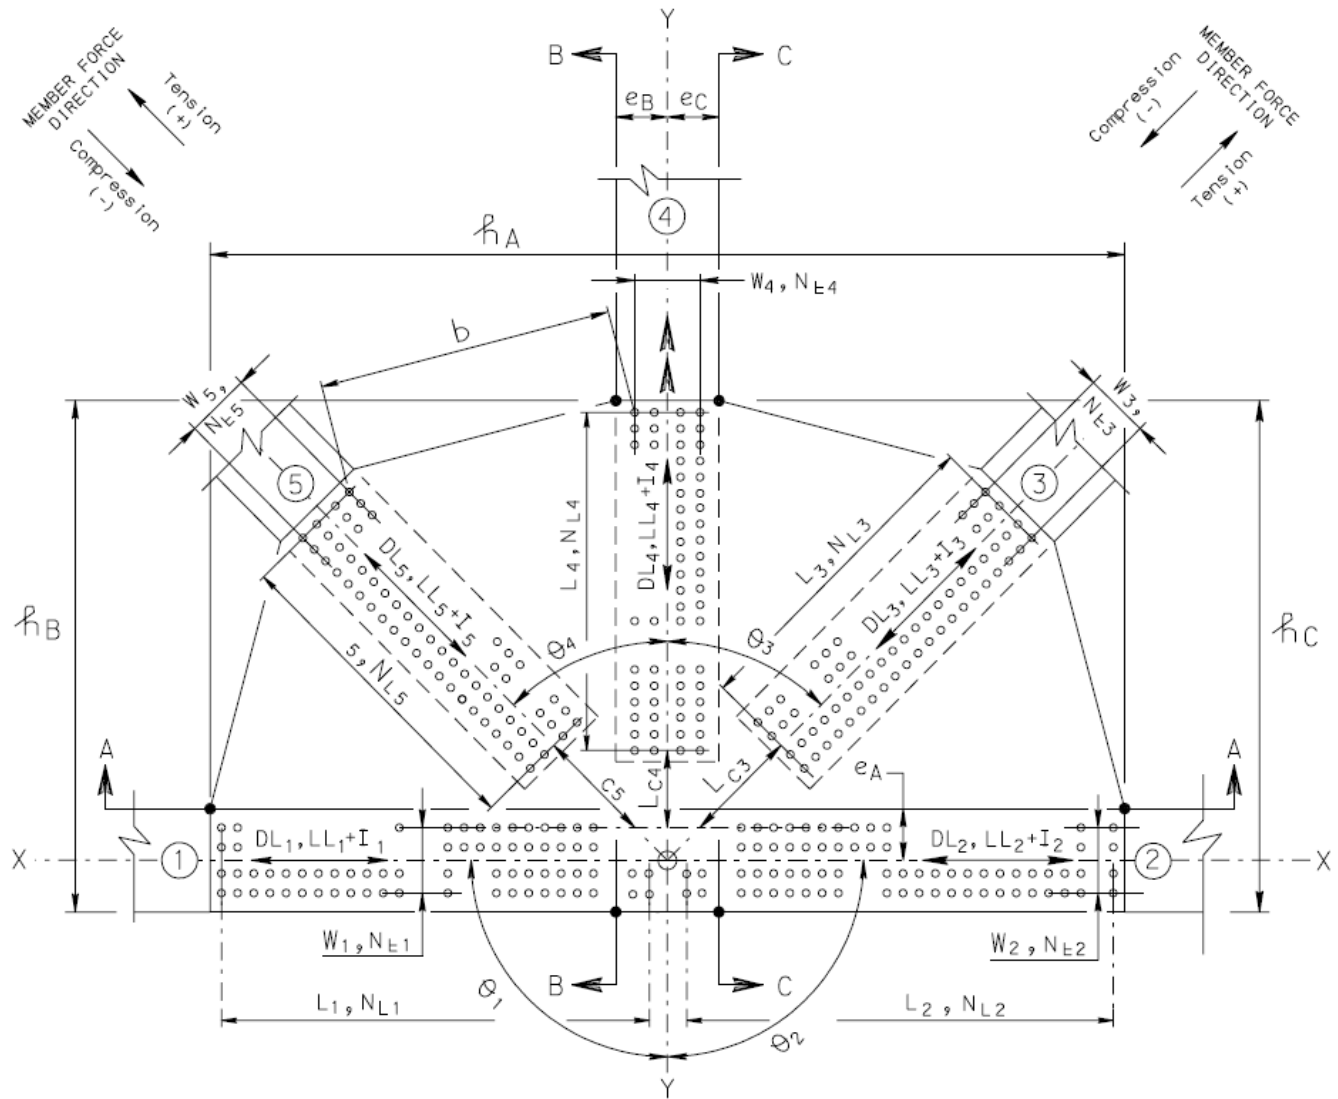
Gusset Plate Geometry: Horizontal Lower Chord
